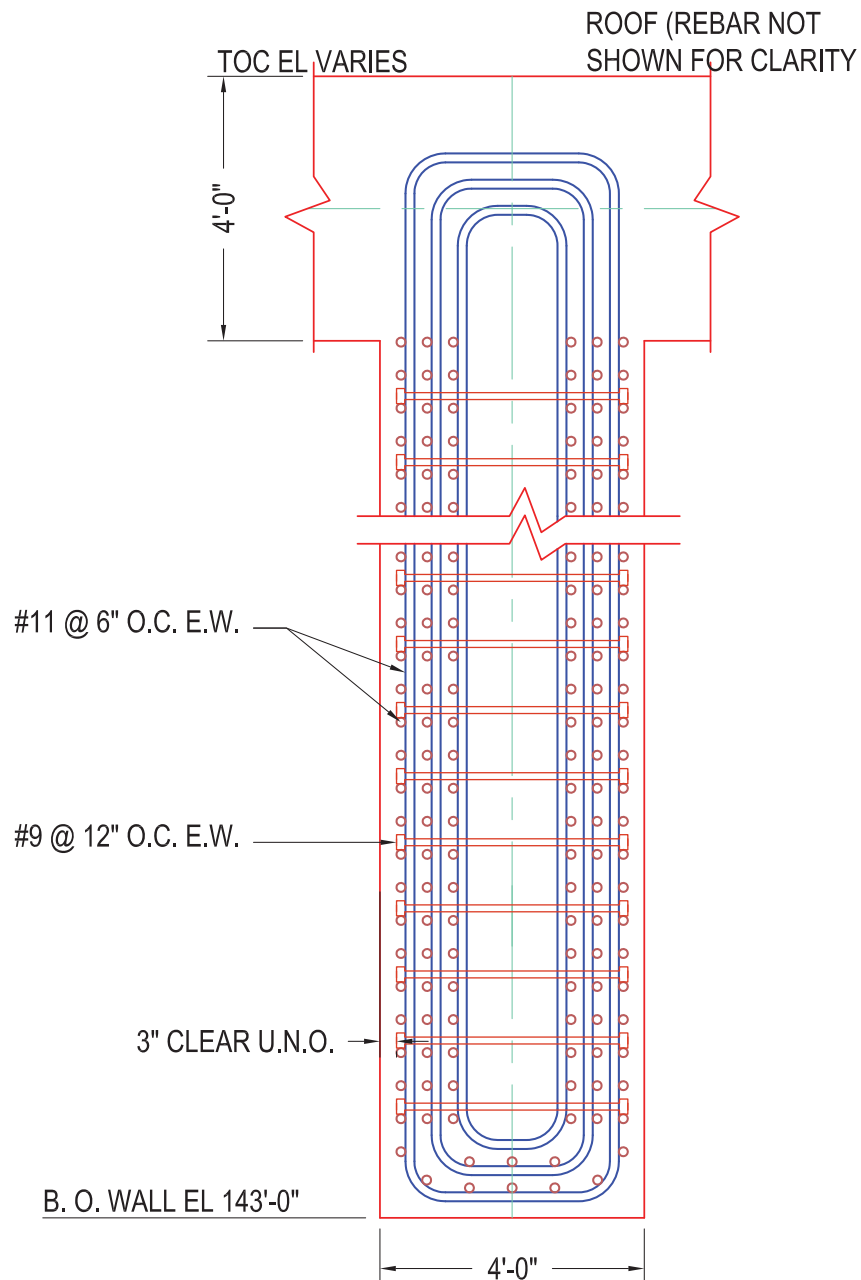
B-15: RXB Reinforcement Elevation at Grid Line 4 Wall
